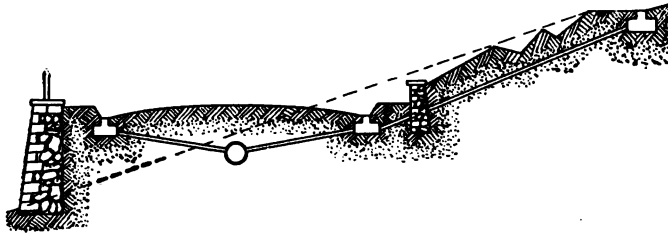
Hillside Road with Retaining and Revetment Walls.
